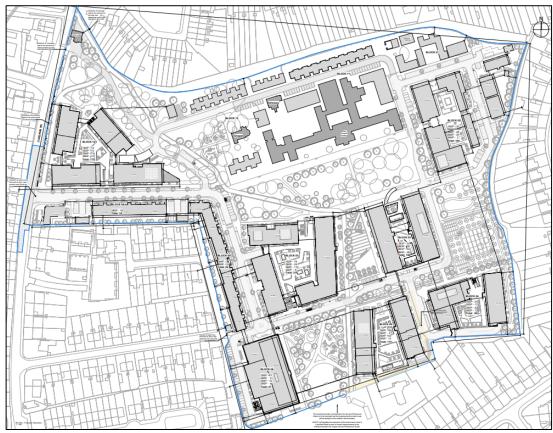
Extract from the Site Plan, Proposed, Masterplan showing the Masterplan layout. (Source: Reddy A+U Drawing No. DCD-02-SW-ZZZ-DR-RAU-AR-1050 P3 S-1, 2024.)
